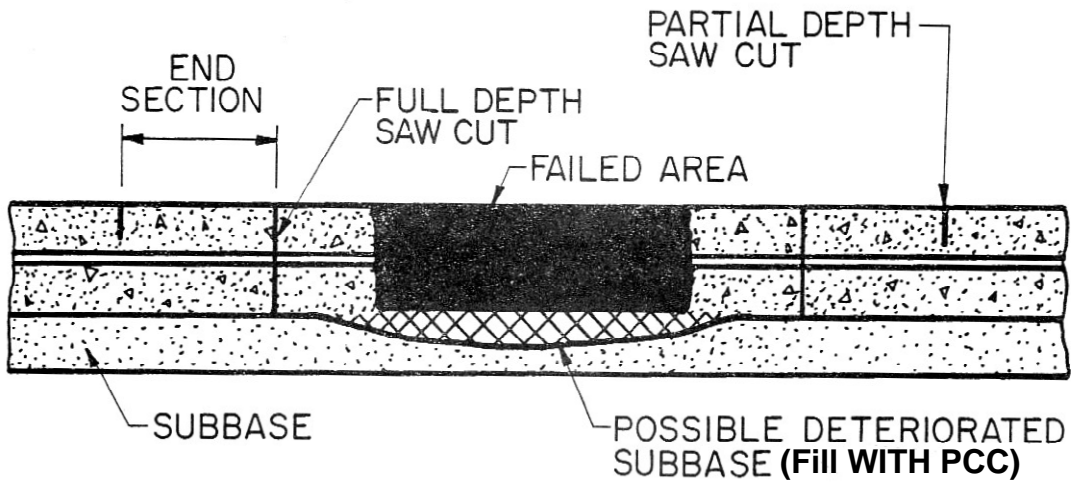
Illustration of the center section (complete removal) and end sections (where concrete around the reinforcement is removed).
